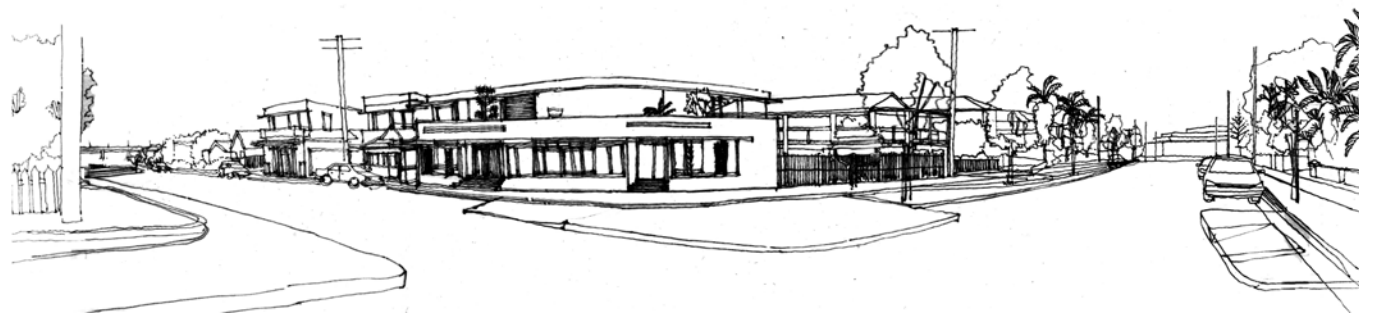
Suggested Treatment for Hargraves Street and Hutton Road
